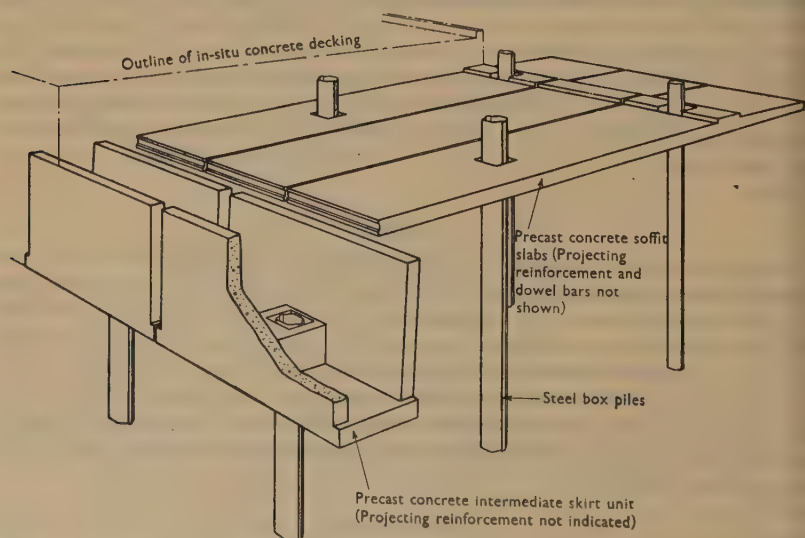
ARRANGEMENT OF INTERMEDIATE SKIRT UNITS AND SOFFIT SLABS
